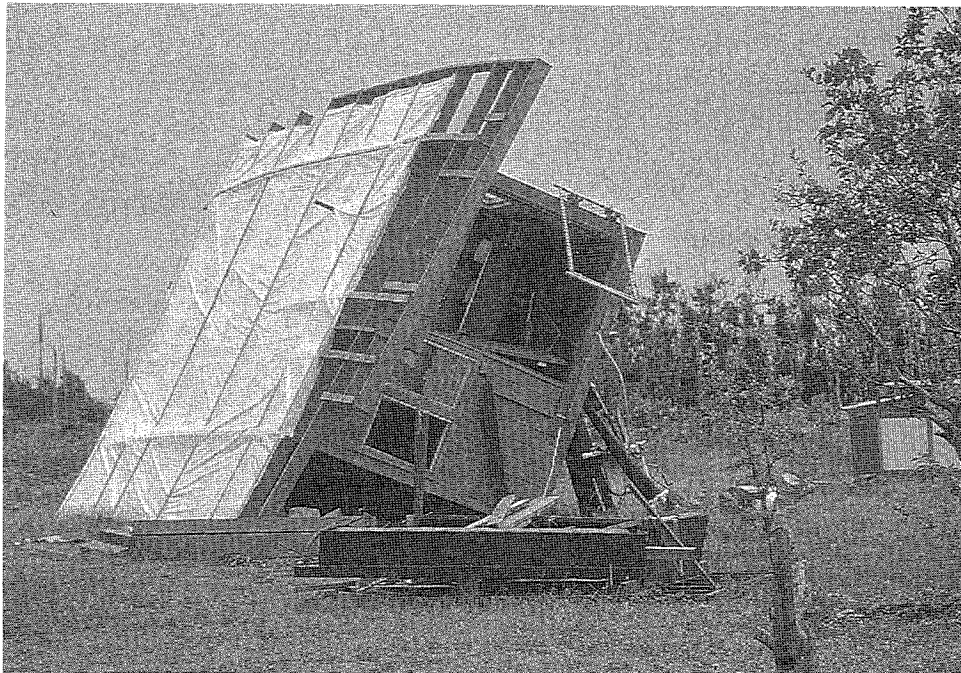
With its large overhangs and lacking connection to a foundation, this small home was lifted and moved several feet from its original location.
